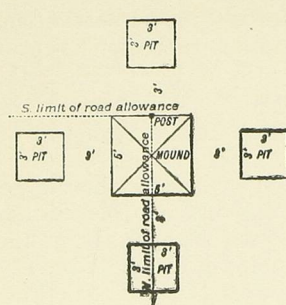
Post, mound and pits for section and quarter section corners on correction line, south limit of road allowance—Plan.
